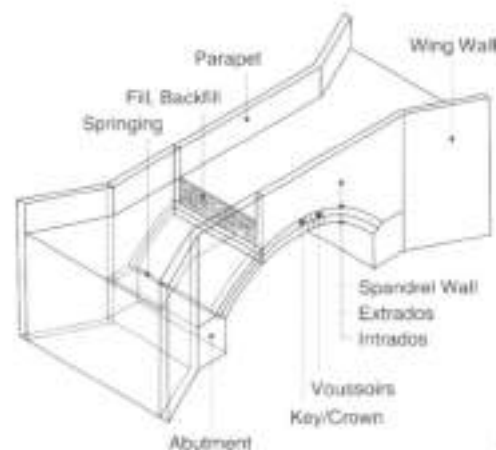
The main element of a masonry arch bridge (Proske and van Gelder, 2009)
